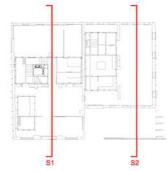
Second-floor plan. © Taller 9s Arquitectes
